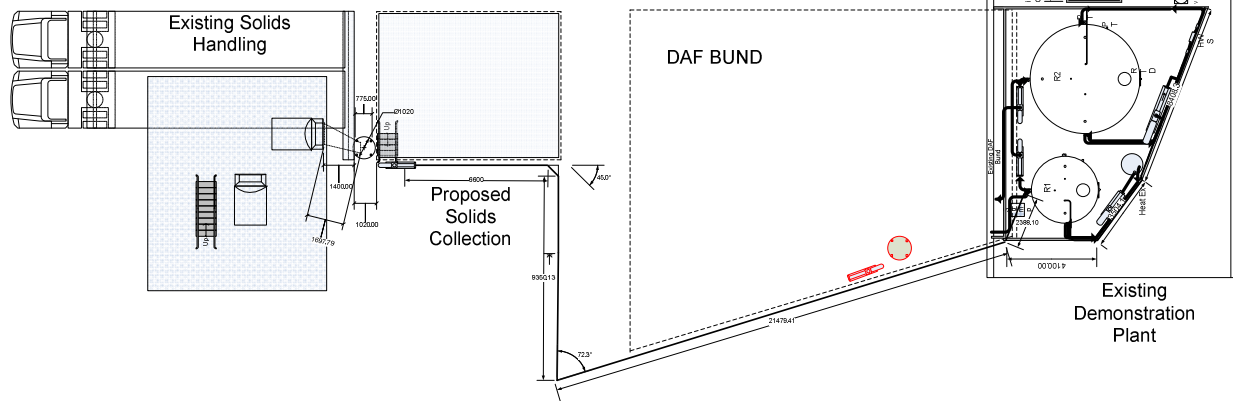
Layout of Solids Handling System within demonstration plant host site in 2011
